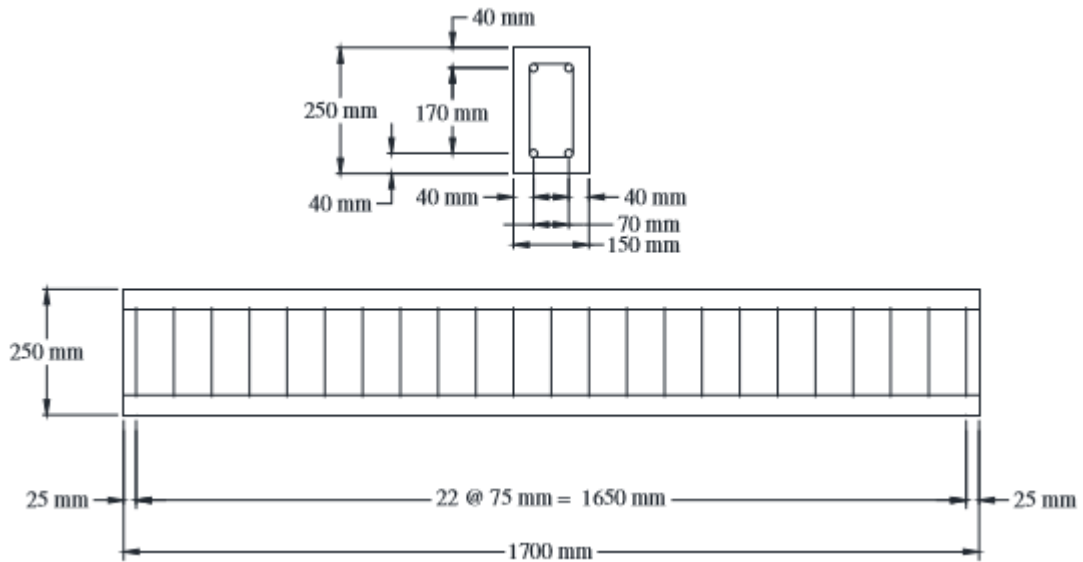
Beam Cross Section (Top) and Longitudinal Section (Bottom) [34]
